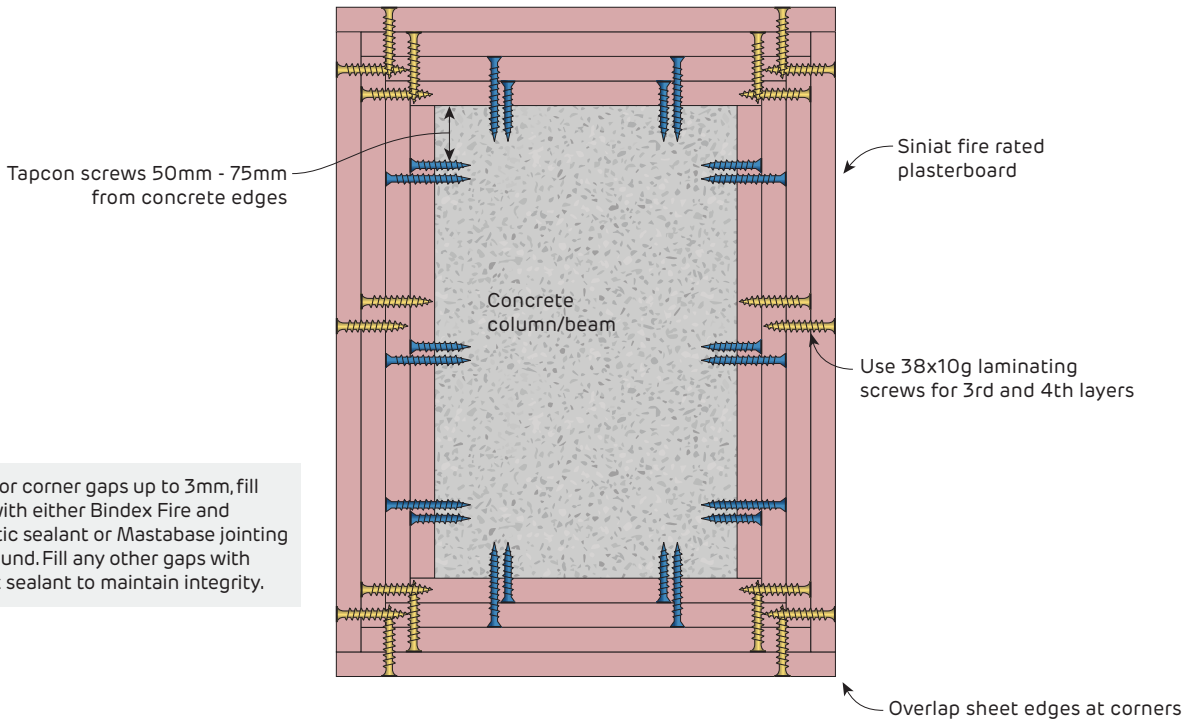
4 Sided Protection Concrete Column/Beam Plan
